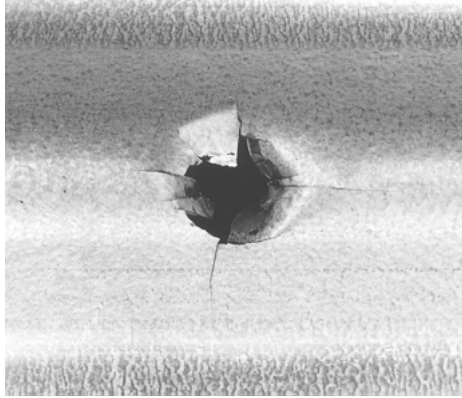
Fatigue Cracking of Steel Sheeting under Cyclic Wind Forces
